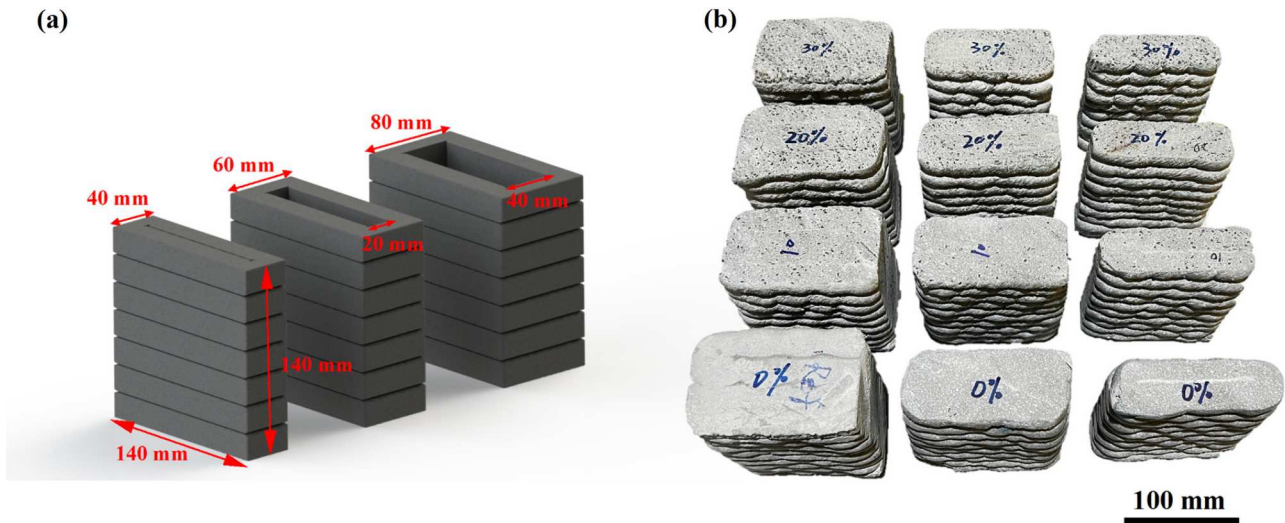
(a) Schematics of test specimens; (b) 3D printed rubberised cementitious composites blocks (built-in air cavity sealed at the top and bottom for the acoustic test).
